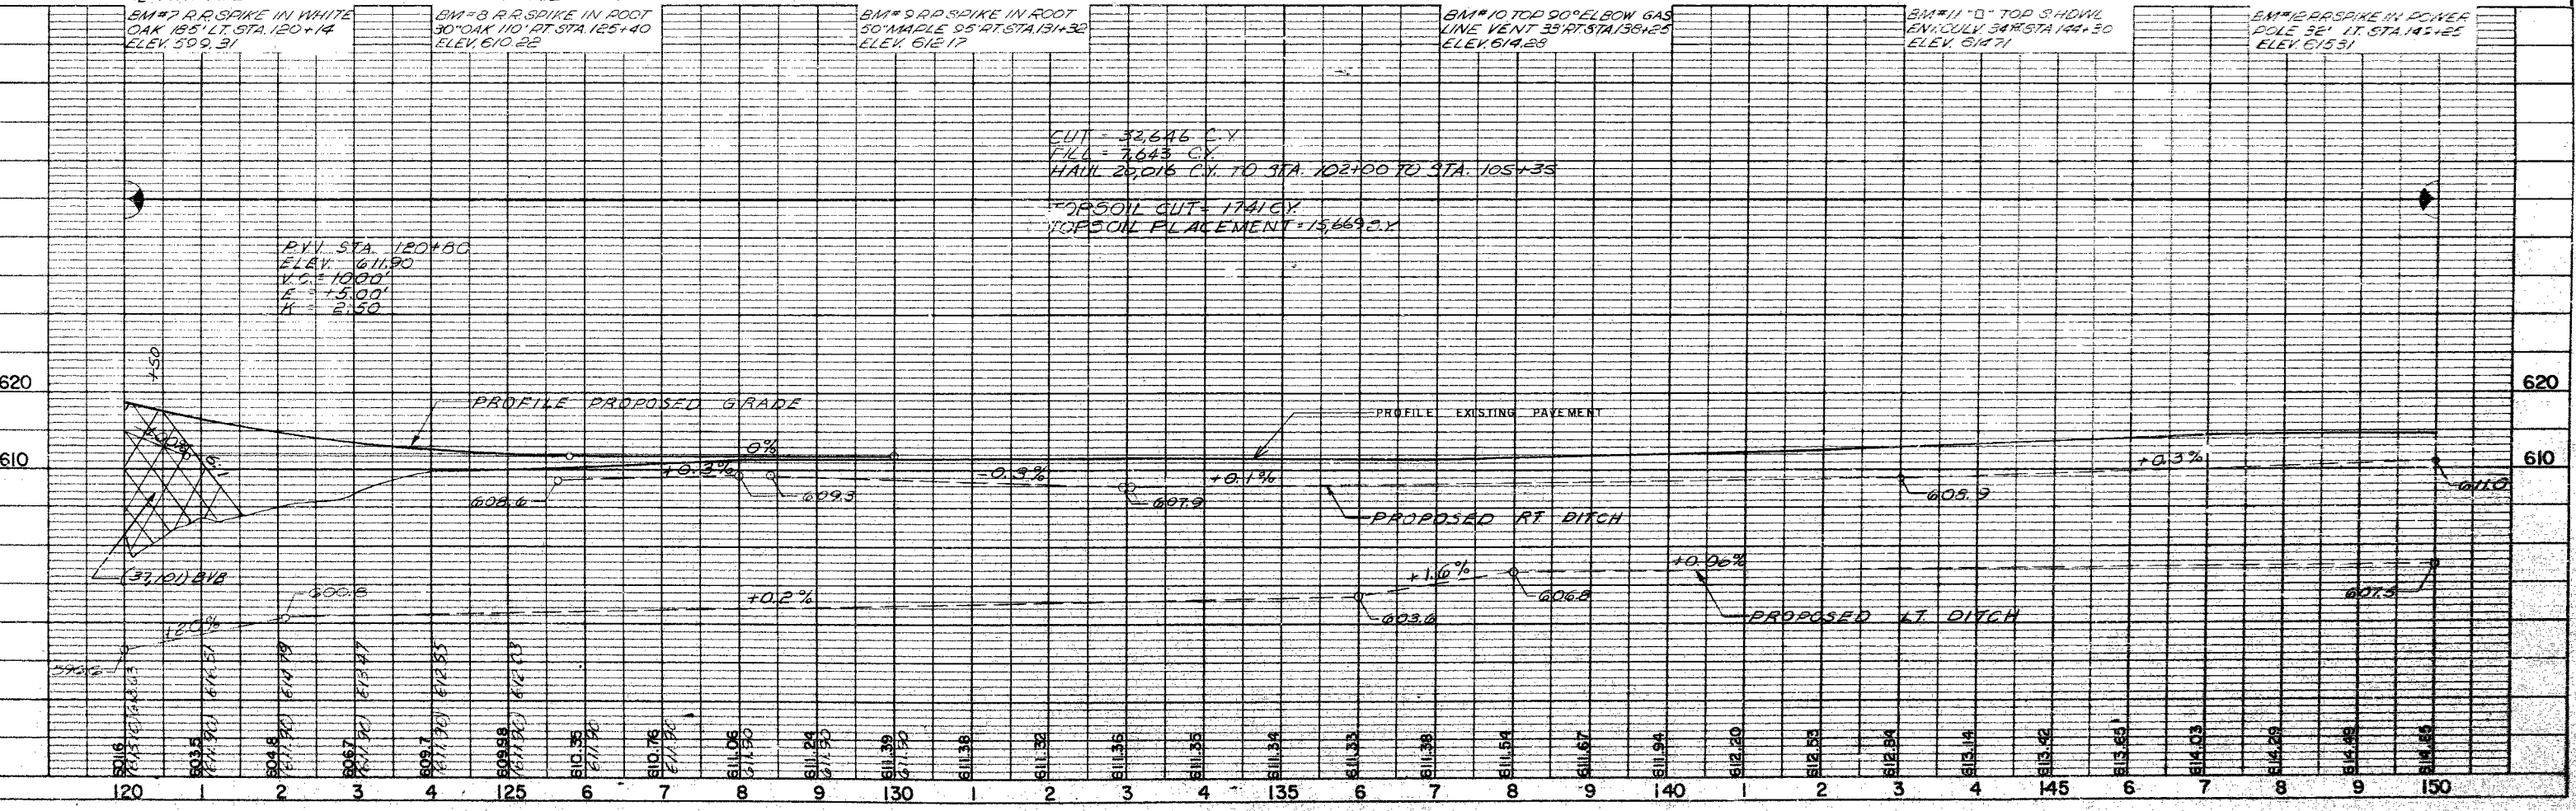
PLAN PROFILE & P. & S. STANDARD
